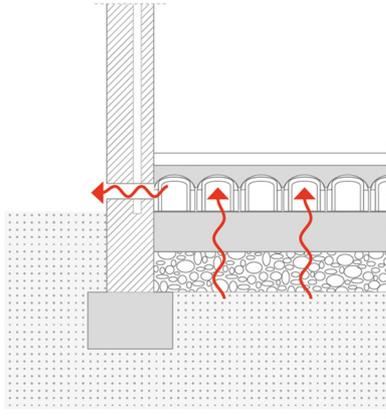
Aerated cavity floor placed over an existing floor slab. (1) Prefabricated pieces, [13].
